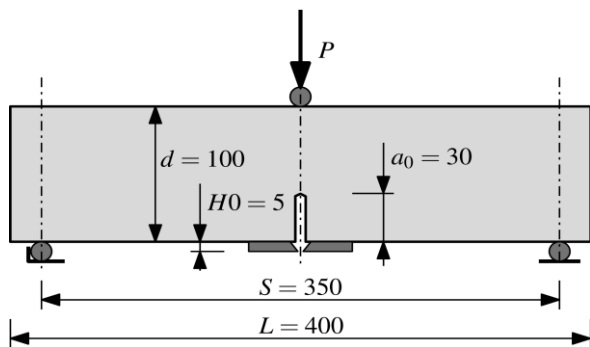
Fracture testing configuration and geometry of specimen with elongated U-notch.
